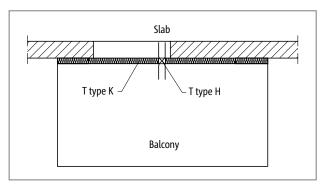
Schöck Isokorb® T type K: Balcony freely cantilevered, optional with T type H (from page 125) with planned horizontal loads, e.g. closed balustrades
